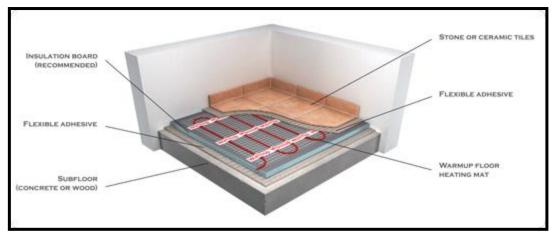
Stone, Ceramic or Marble Tiles Flooring Details (http://www.warmup.co.uk/uk/mat-underfloor-heating-flooring.phtml)
